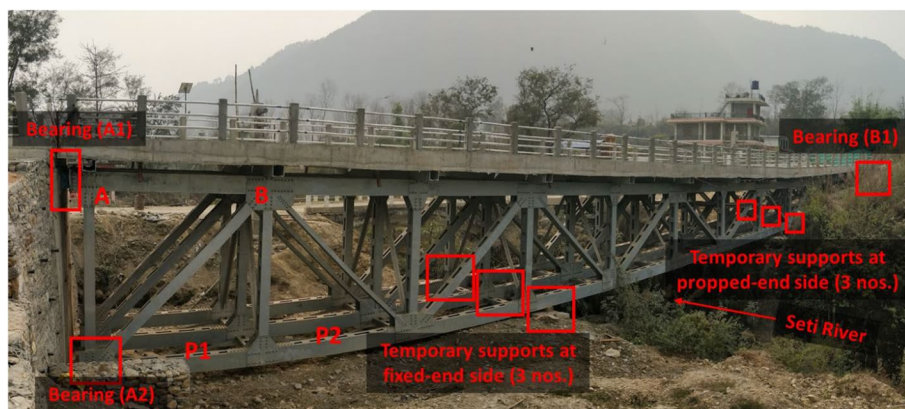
Arrangements of bridge structure, bearings, and temporary supports
